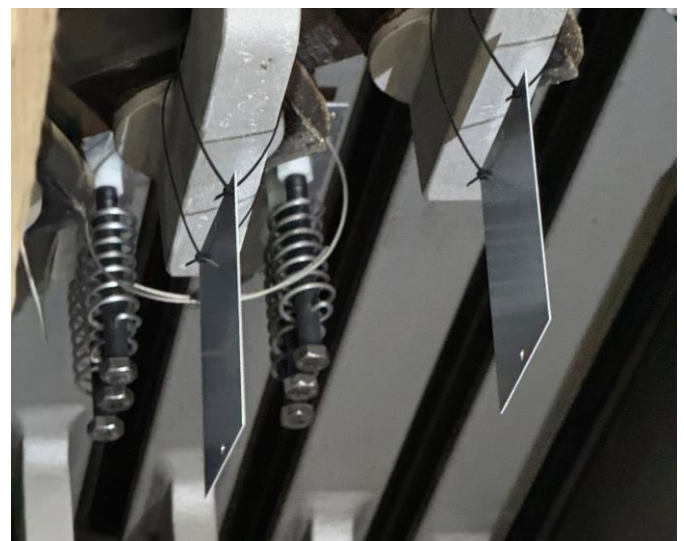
Coils and plates installed in the abutment beneath the expansion joint. Source: Author
